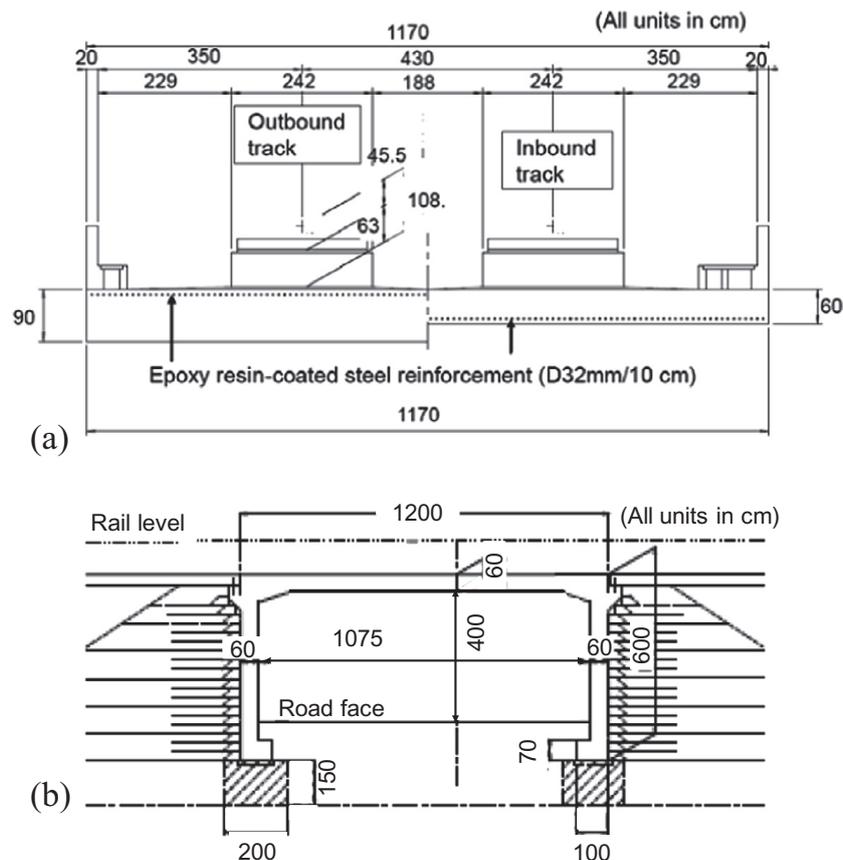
GRS integral bridge (alternative plan 2): (a) transversal cross-sections of the girder at the top of the facing (left) and the center (right); and (b) longitudinal cross-section of the bridge.
